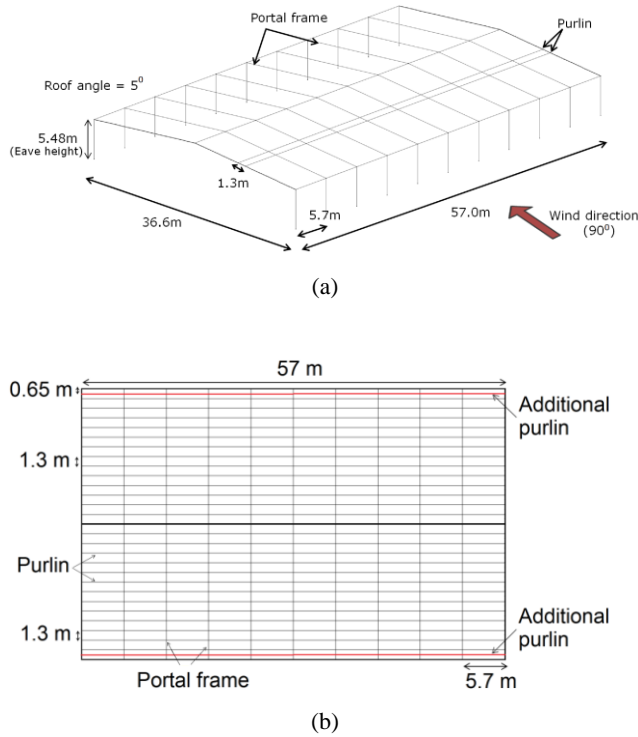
Shed details (a) Overall dimensions (b) Plan view of the roof with purlin arrangement
